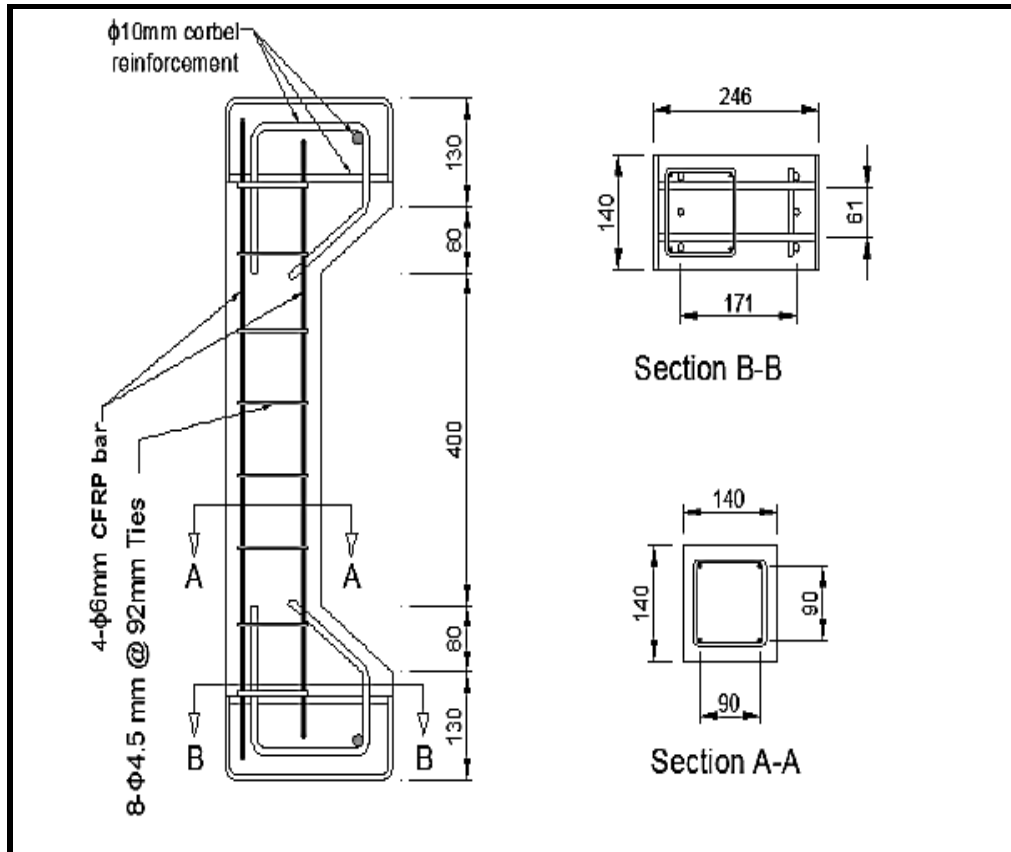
CFRP reinforced column detail. (Alwash and Jasim (2015))
